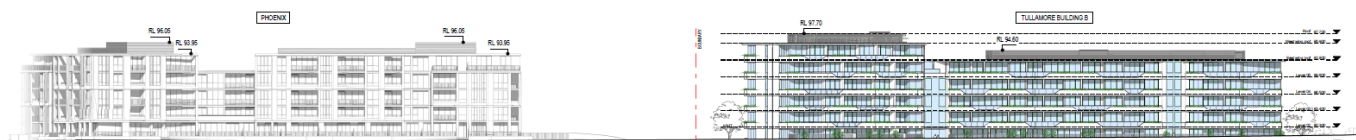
Doncaster Road Streetscape/Southern Elevation of existing Phoenix Building and Proposed Tullamore Building B.
